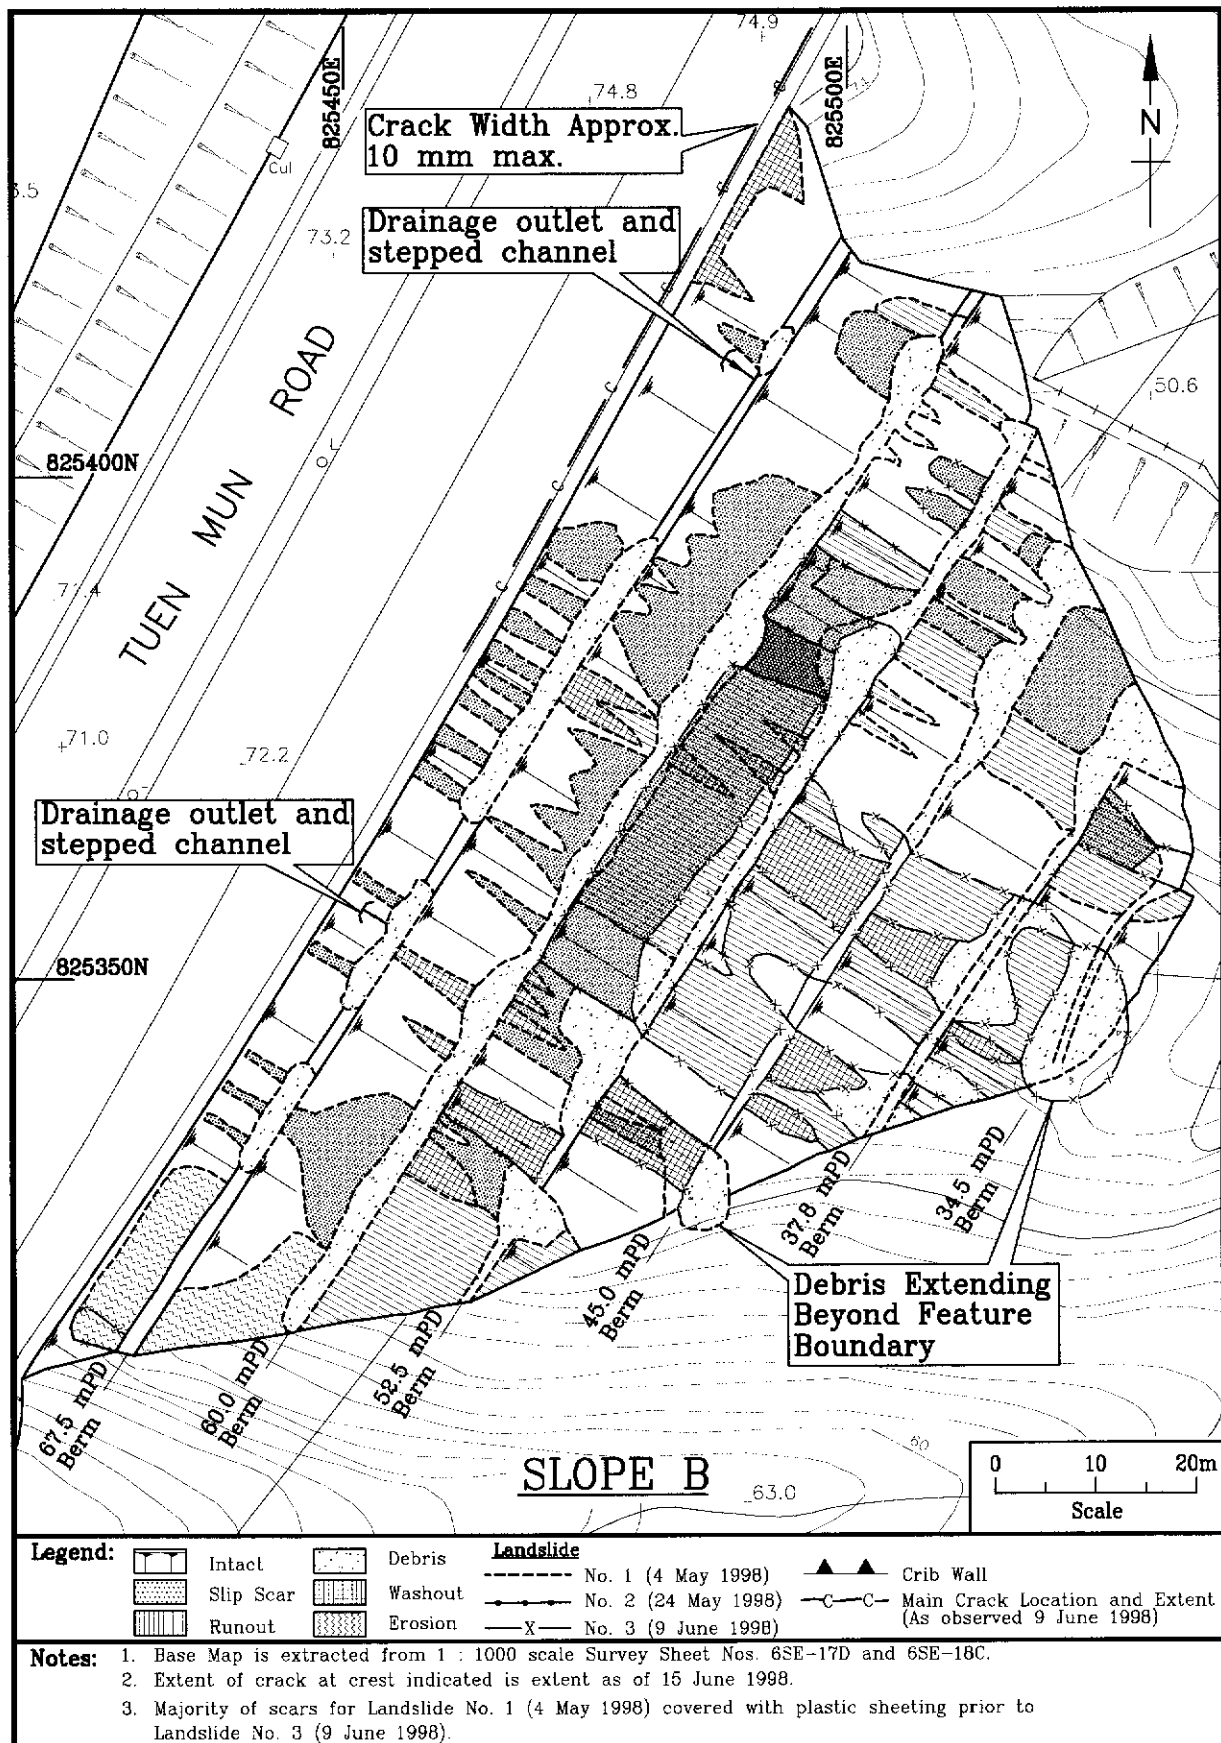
Completed Formation (Slope B) Showing Observations after Failure
